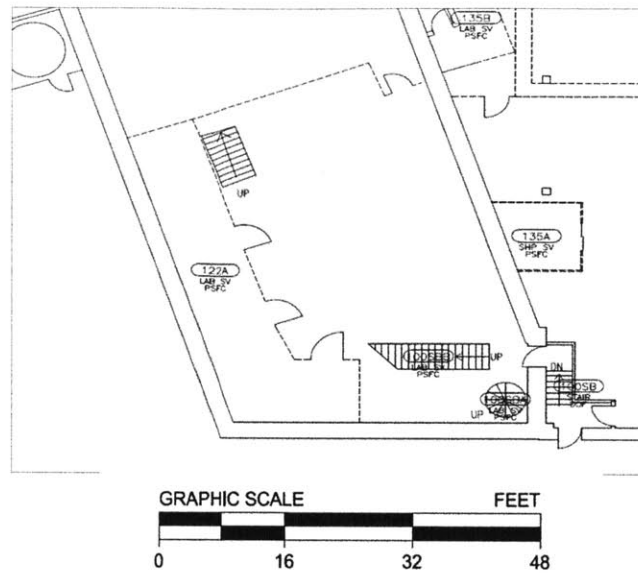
Corner room in MIT building NW21 with scale in feet. The second floor is not shown in figure above. Figure adapted from MIT floor plans [MIT].
